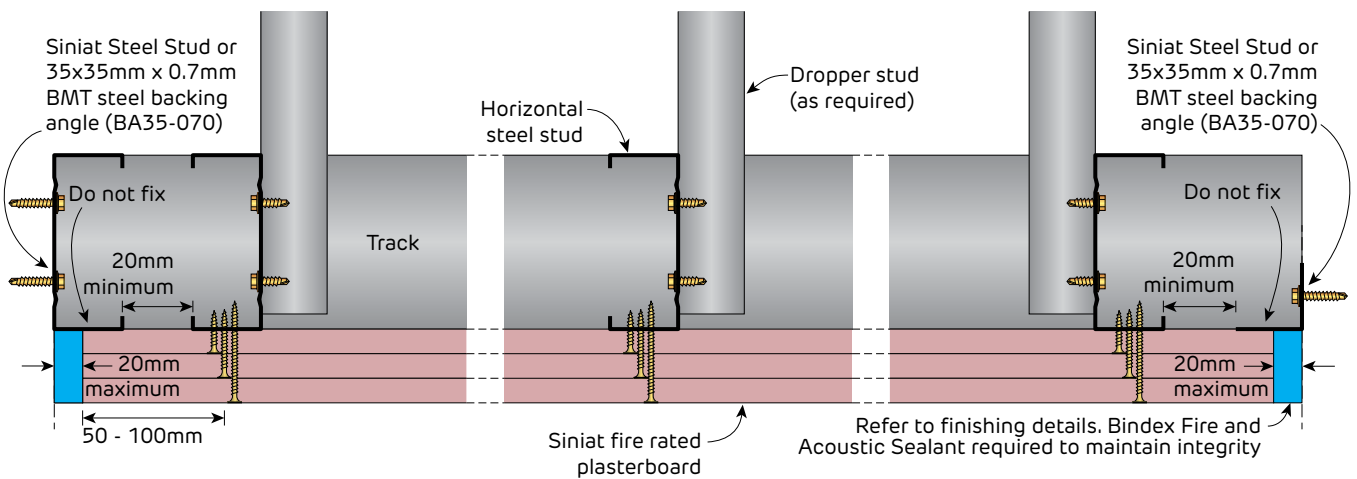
Stud Ceiling Type C1 - Edge Detail
